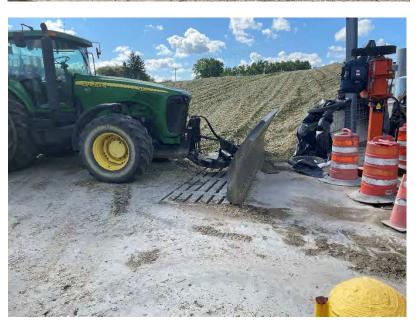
Feed leachate inlet grate in FSA 1 facing south and down.
